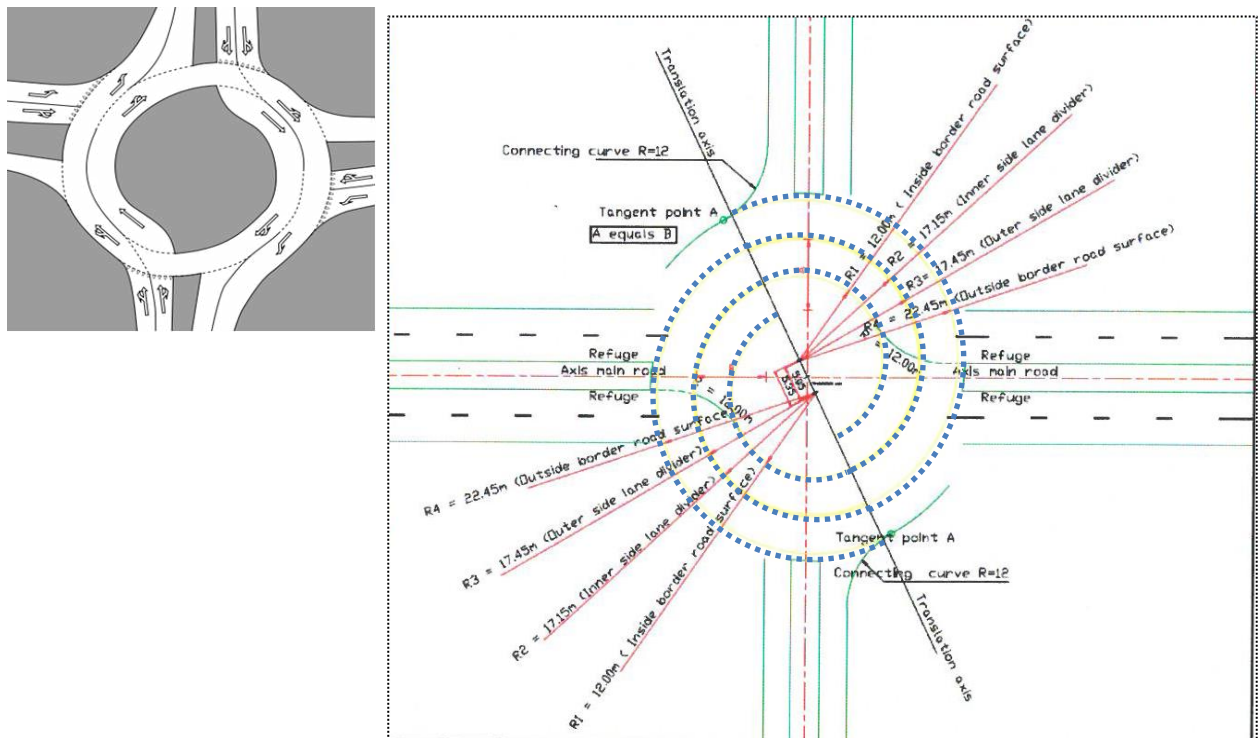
Schematic concept diagram and Geometric details of a turbo roundabout.
